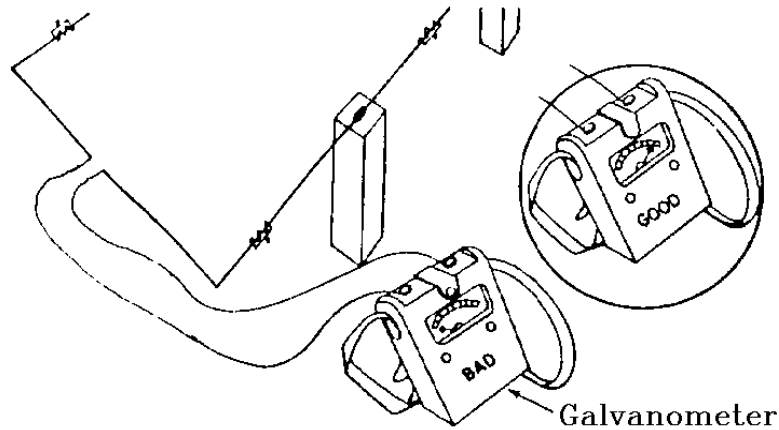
Testing A Blasting Circuit With The Blasting Galvanometer.
